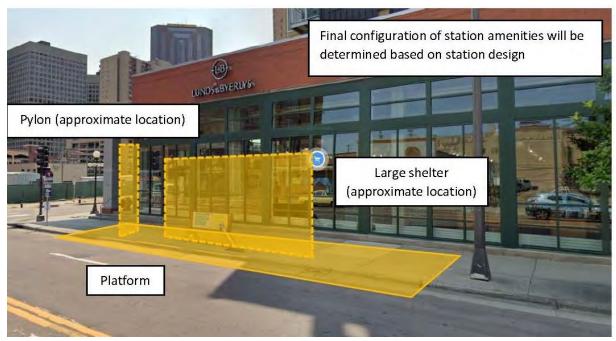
Robert Street North and 10th Street East proposed southbound platform.
